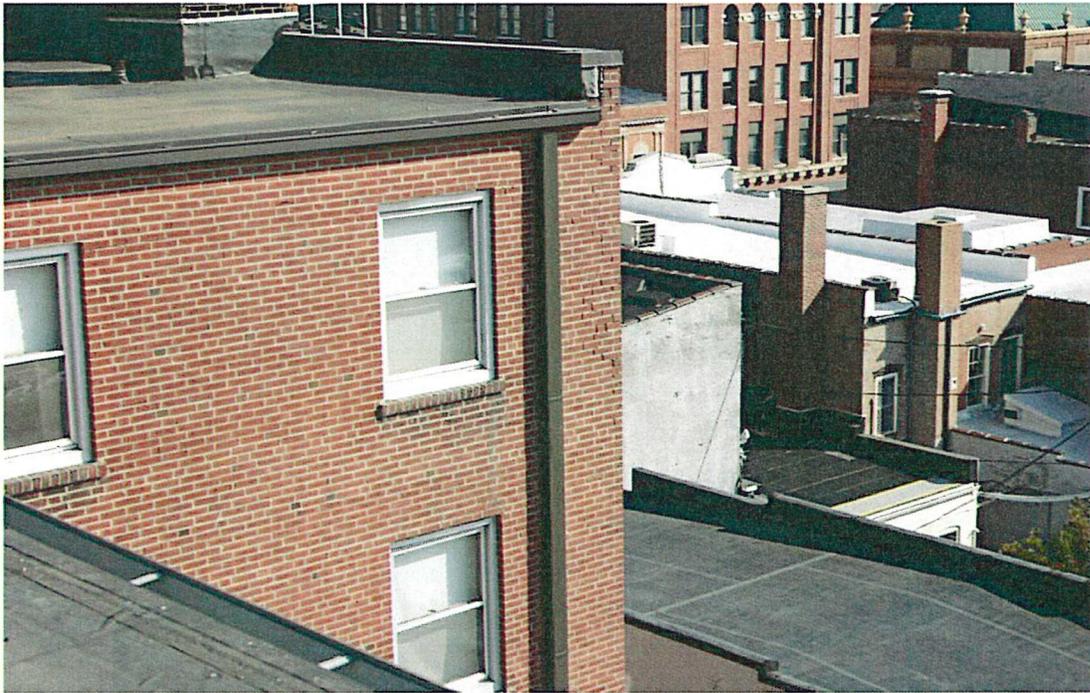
Southeast Corner of Upper Roof. Note, masonry distress at parapet and sixth floor wall at corner.
